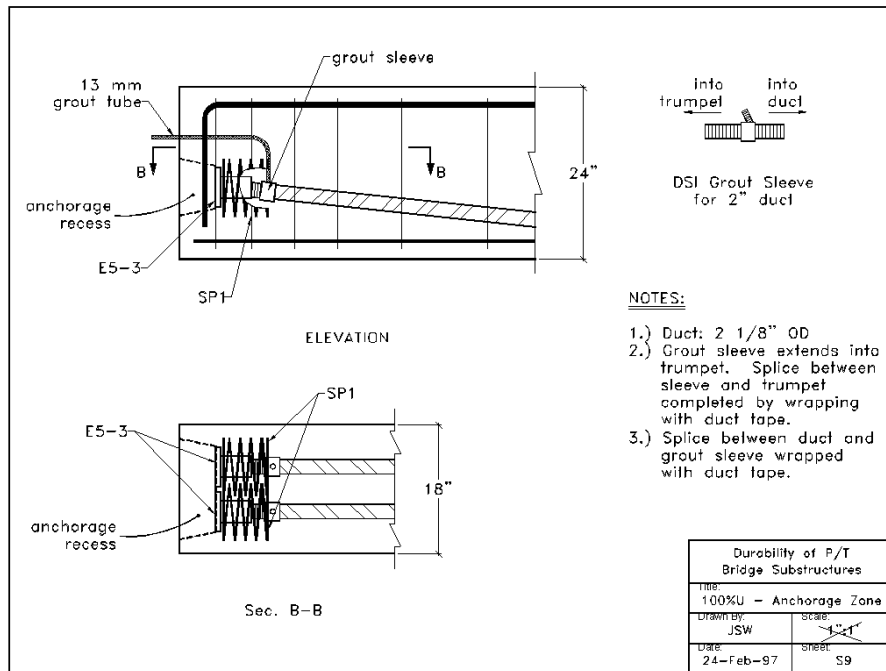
Sheet S9: 100%U Anchorage Zone<sup>2</sup>
